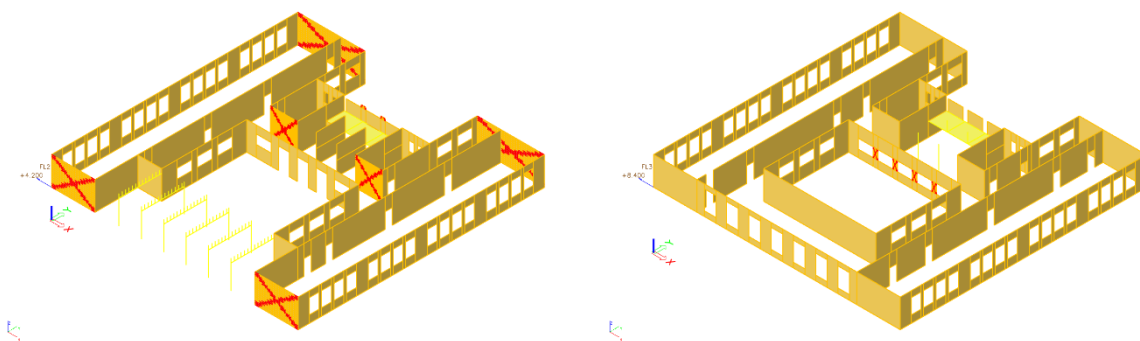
Numerical model with reduced elastic modulus at crack location in ground floor (left) and first floor (right)
